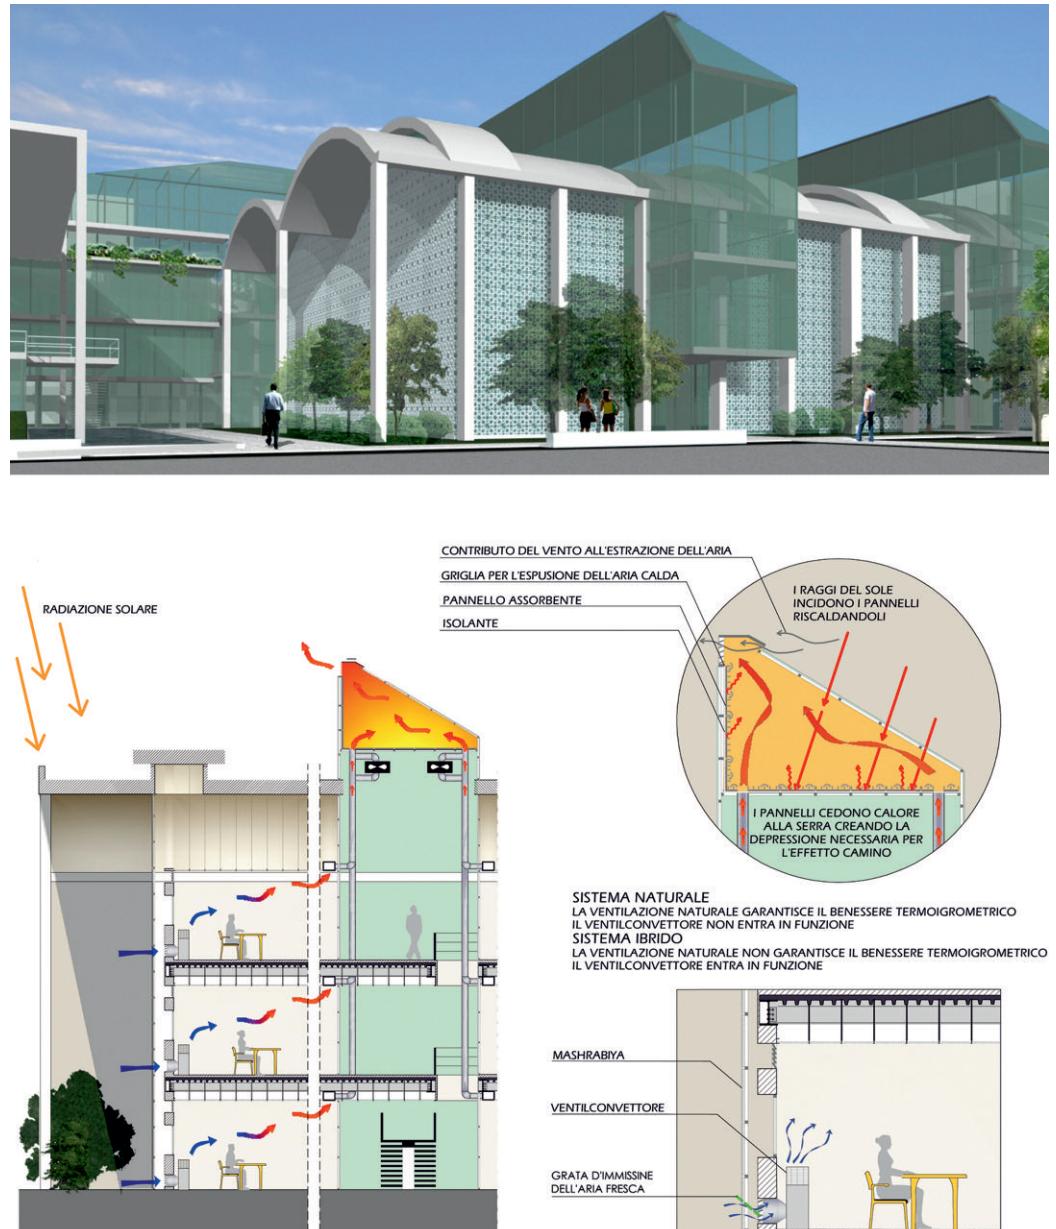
Integrated solar greenhouse system and fan coil system inside one of the Ajovalasit Pavilions built with a reinforced concrete structure (students: F. Celestra, M. Maranto and I. Trapani, 2008).
